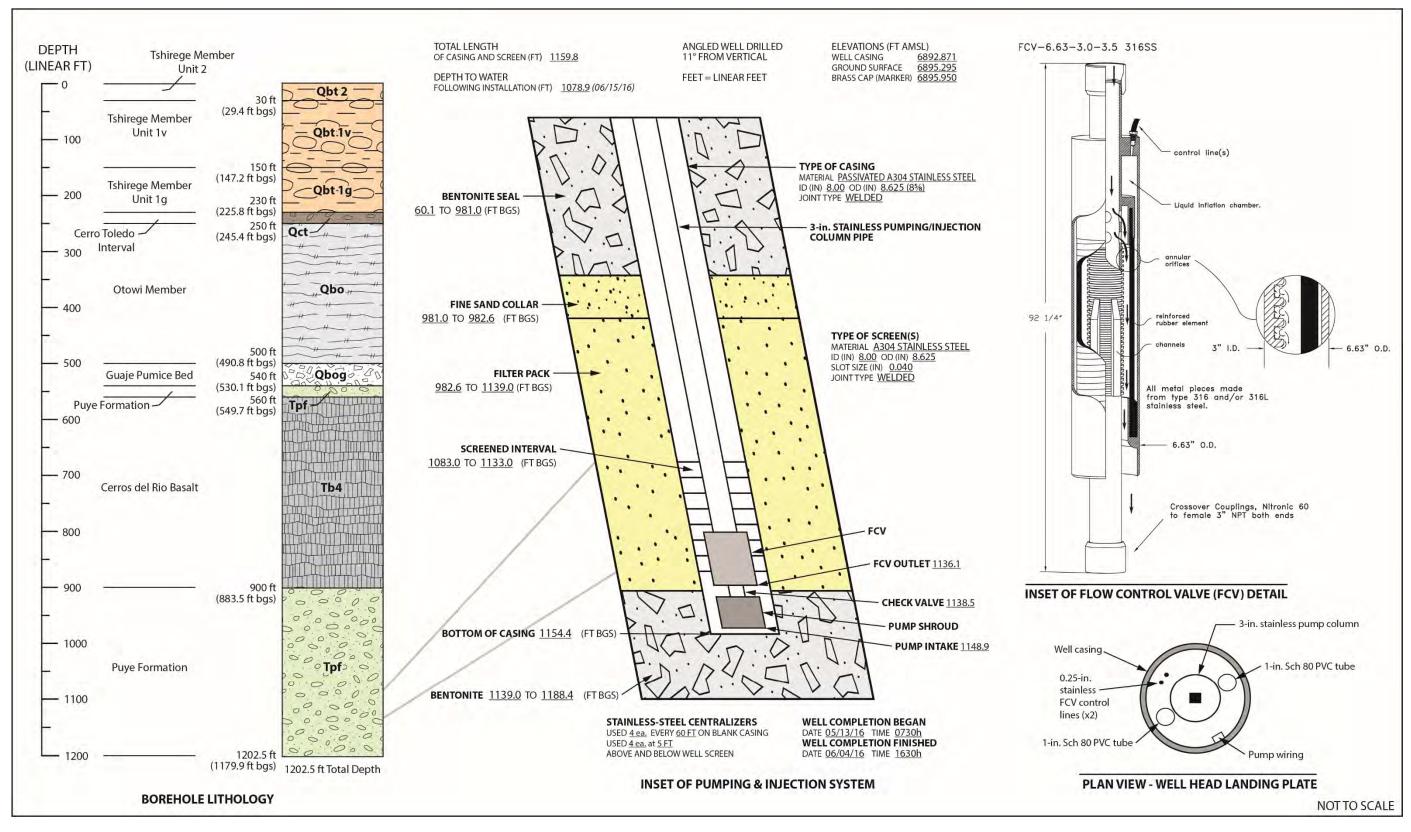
Injection well CrIN-4 as-built diagram with borehole lithology and technical well completion details
